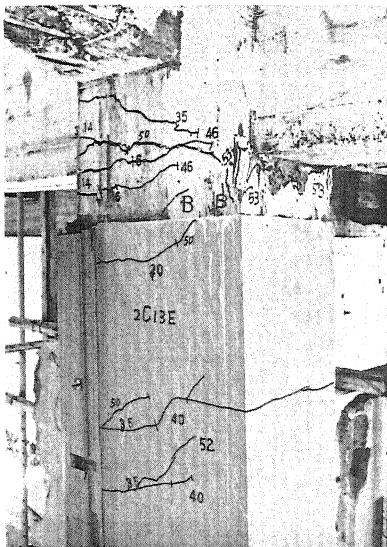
Cracks at top of 2nd Storey Interior Column (Hamamatsu Open Frame Test).
